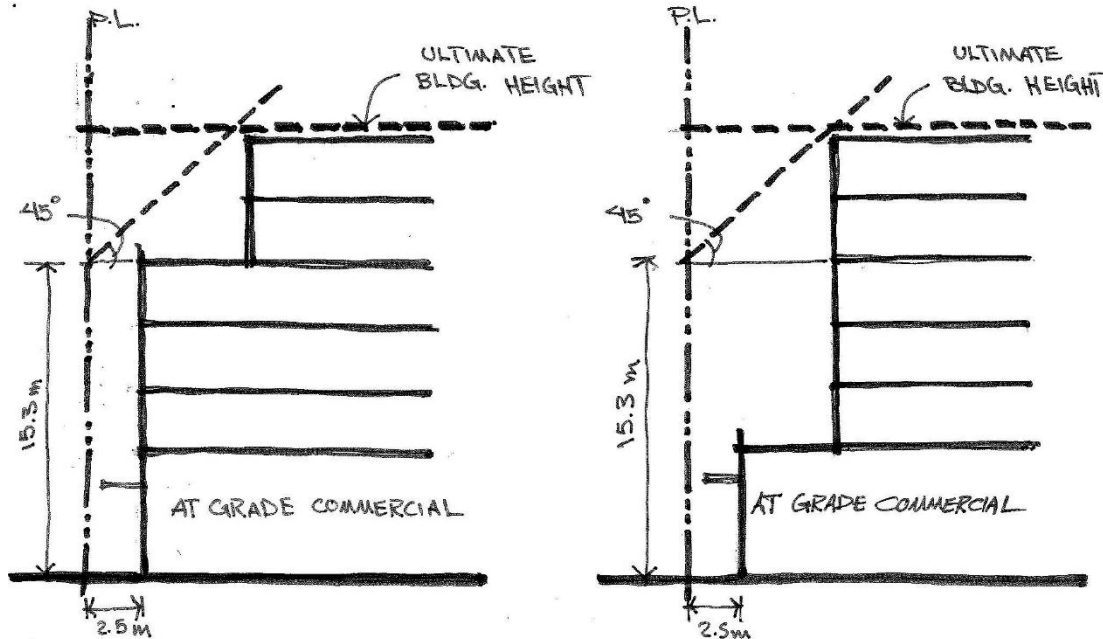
Allowable building envelope where ~~45 degree building chamfer~~ 135 degree height envelope requirement does not apply
